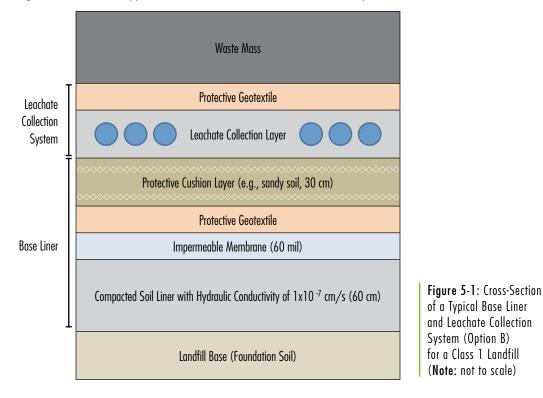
shows a typical base liner and leachate collection system for a Class 1 Landfill.
